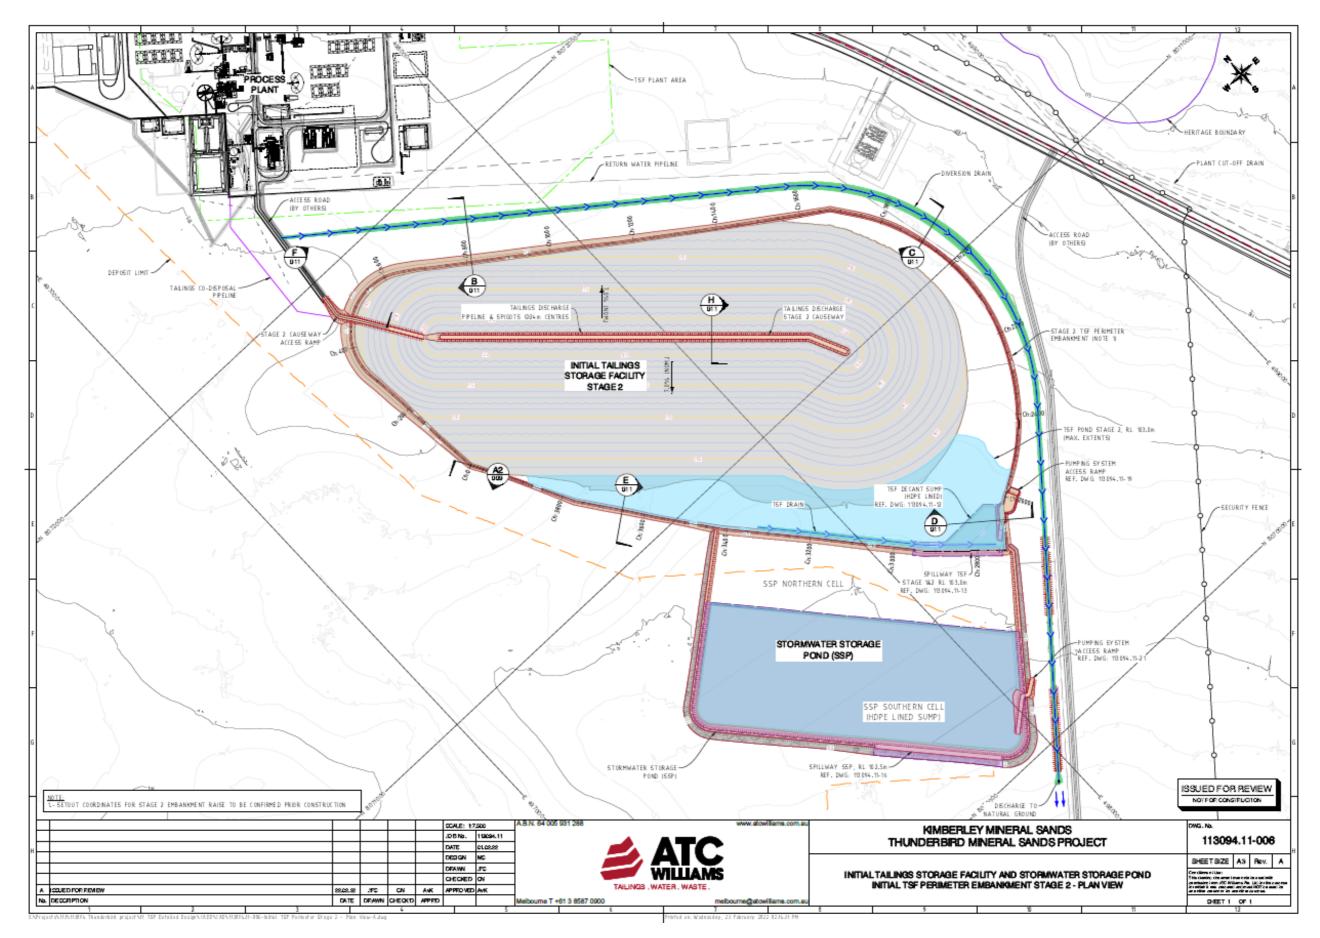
Drawing – Initial TSF and SPP, TSF perimeter embankment stage 2 plan view
